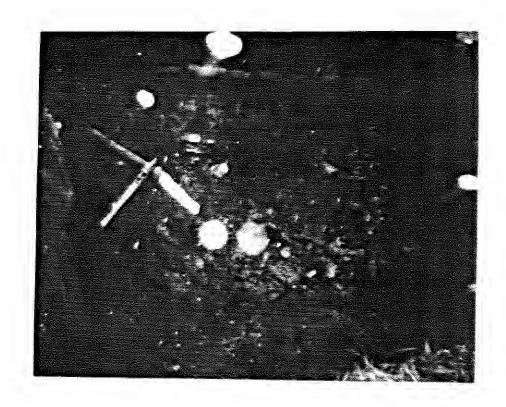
Photo A: Waste Oil Tank Excavation Pit at Building 118, SEAD-30.
